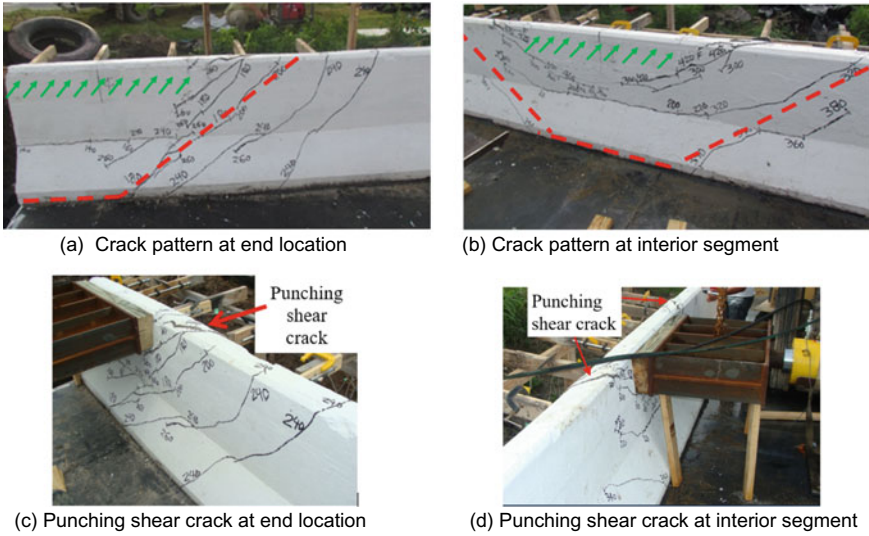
Crack pattern and punching shear failure of a TL-4 steel-reinforced barrier
